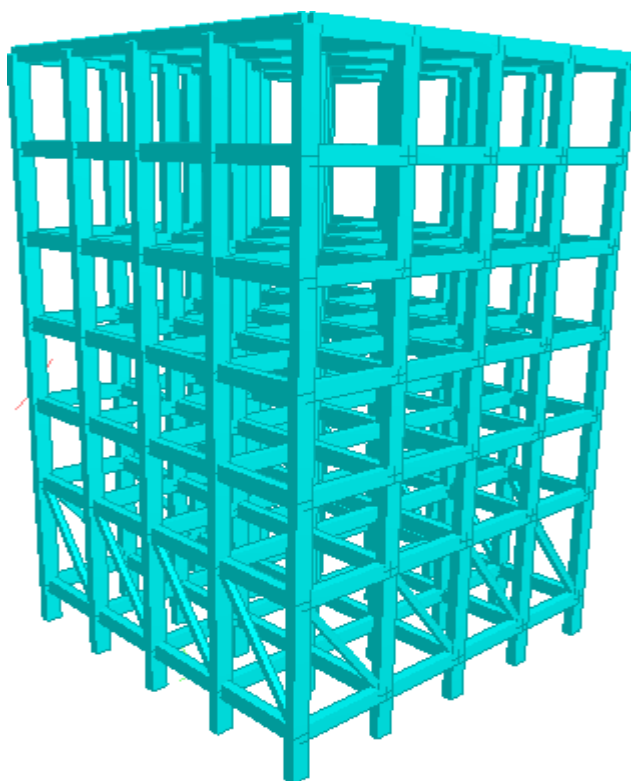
10 3D View Of Ground Floor Soft Storey With InclinedColumn Render View
